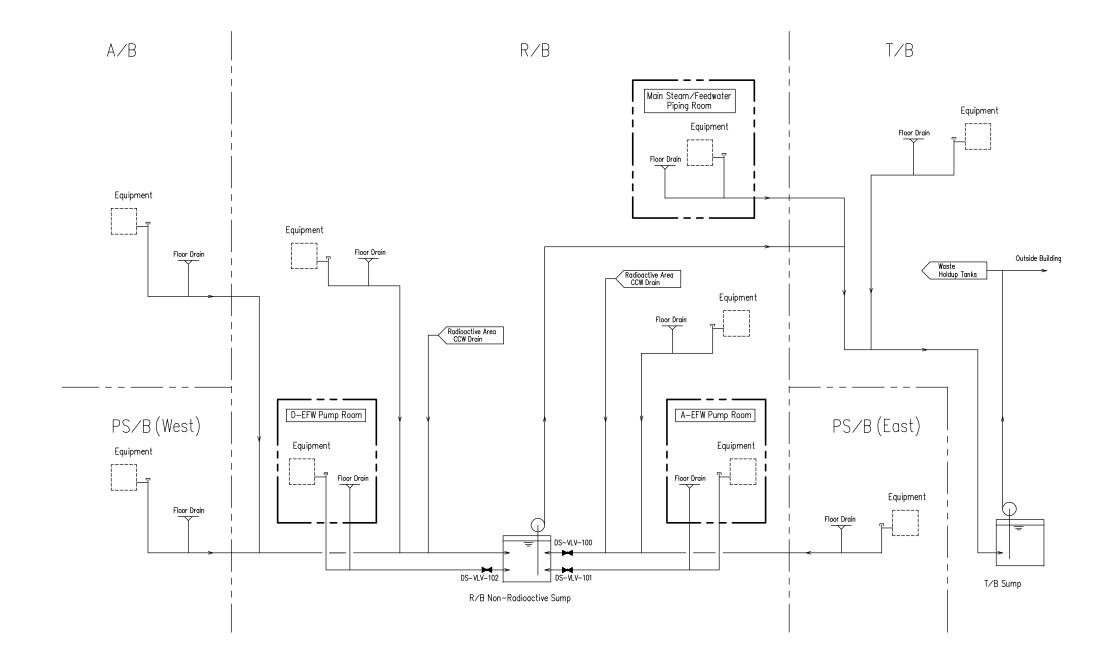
Equipment and Floor Drain System Flow Schematic (Sheet 2 of 2)
